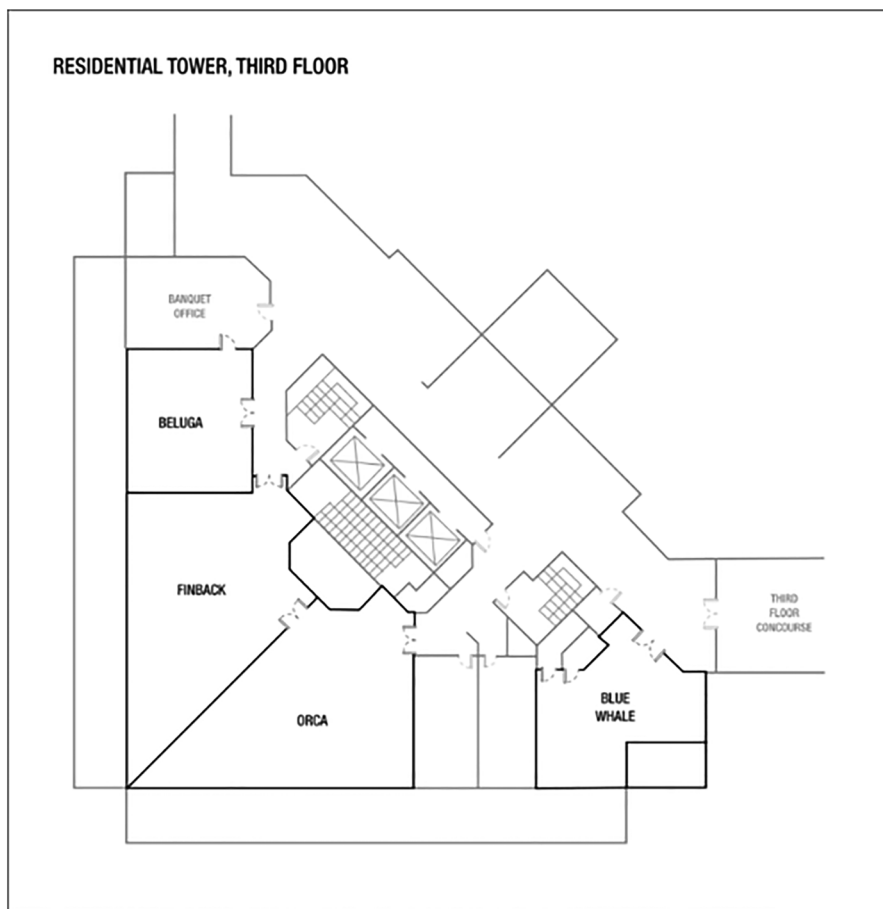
Floor plan: Residential Tower, Third Floor (Source: Sheraton Wall Centre Hotel website)
